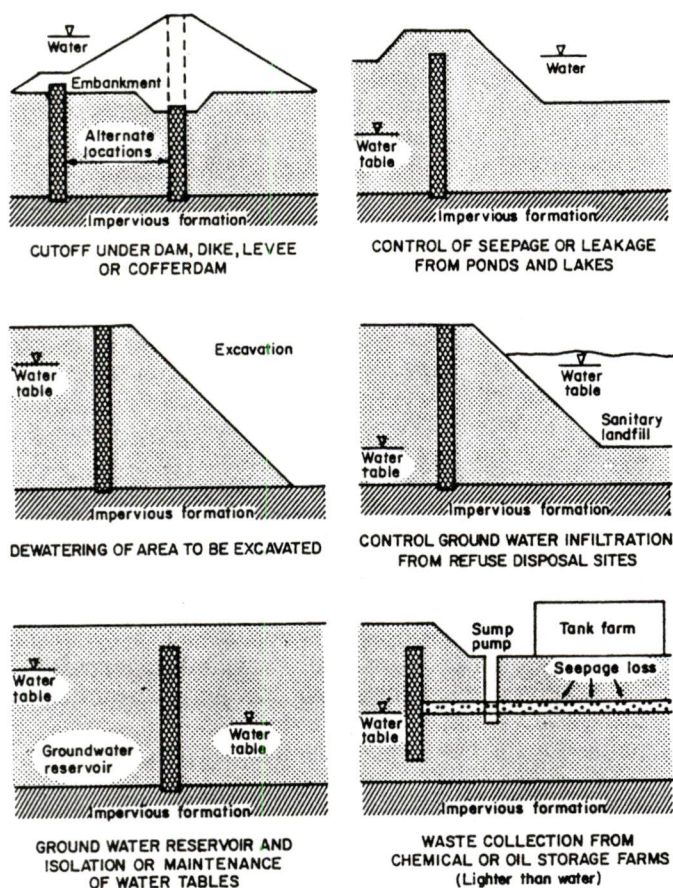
Typical applications for slurry trench cutoff walls. (From Millet and Perez²)
